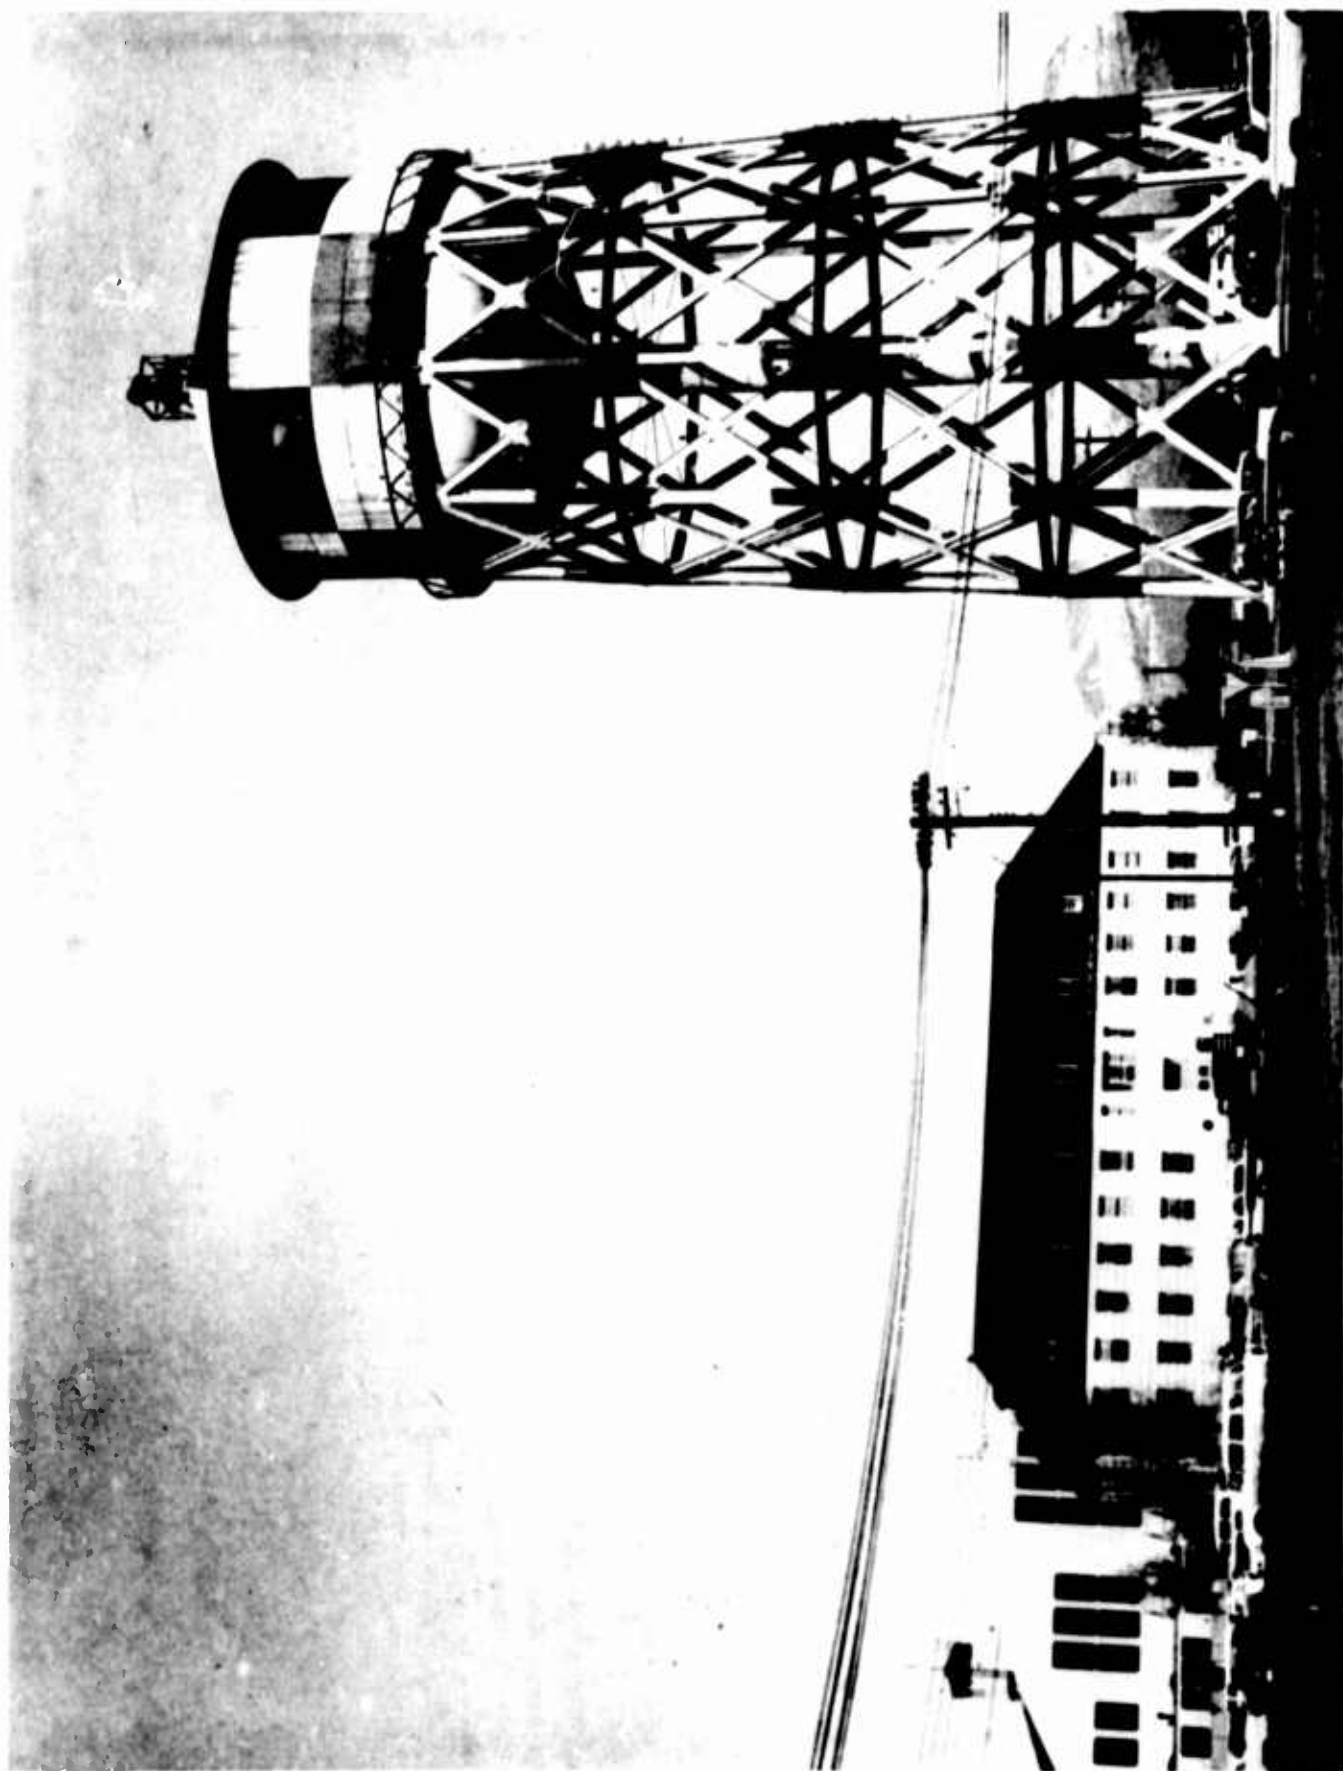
Elmendorf AFB Water Tower (Undamaged. Camera angle gives illusion of tipping.)
